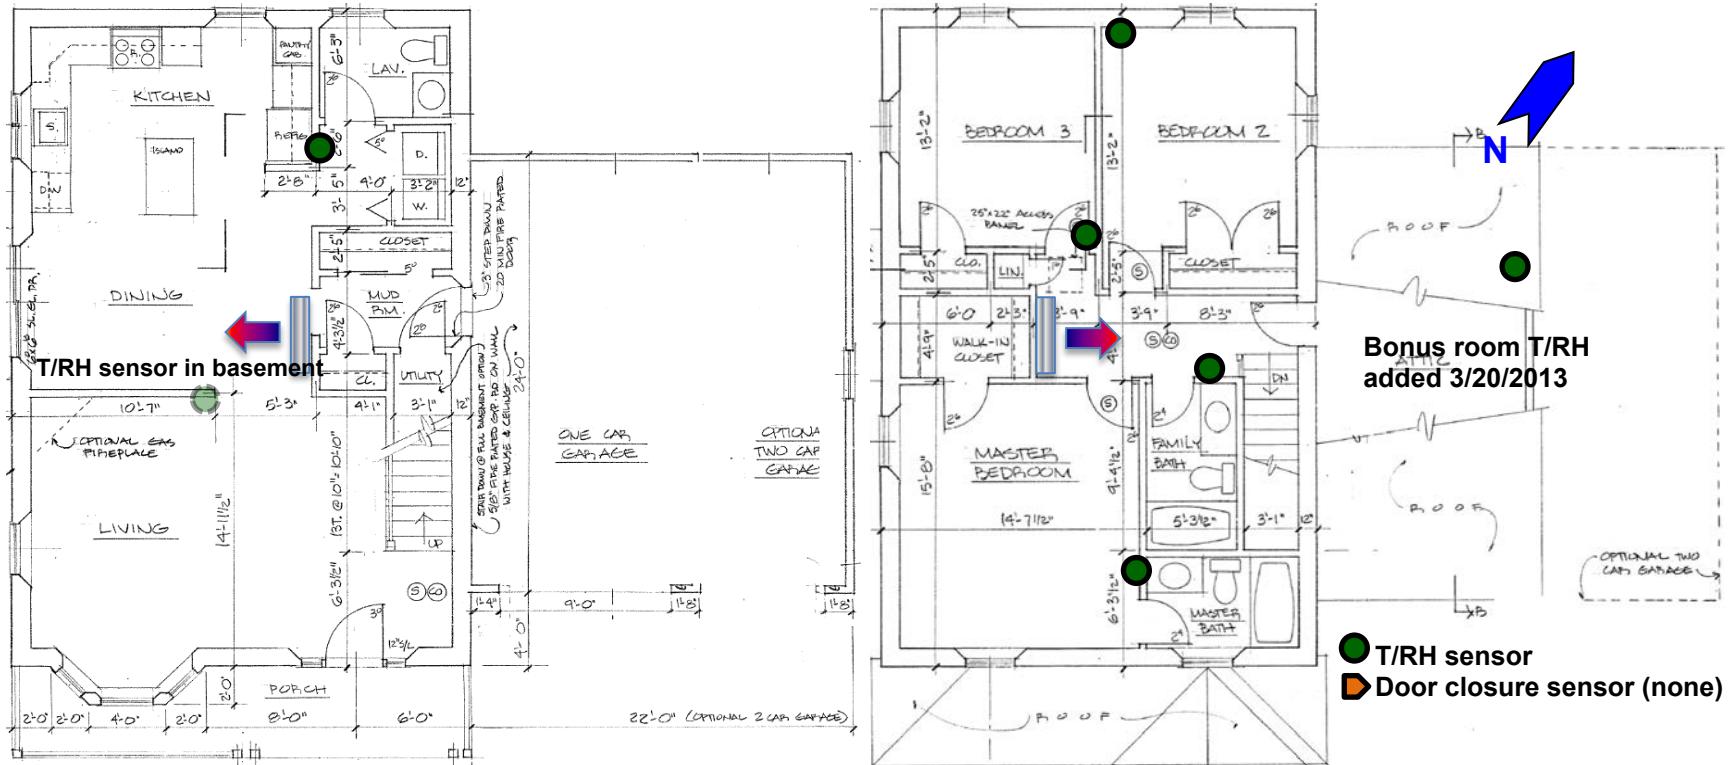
Devens Lot 3 floor plans, MSPH locations, monitoring locations
